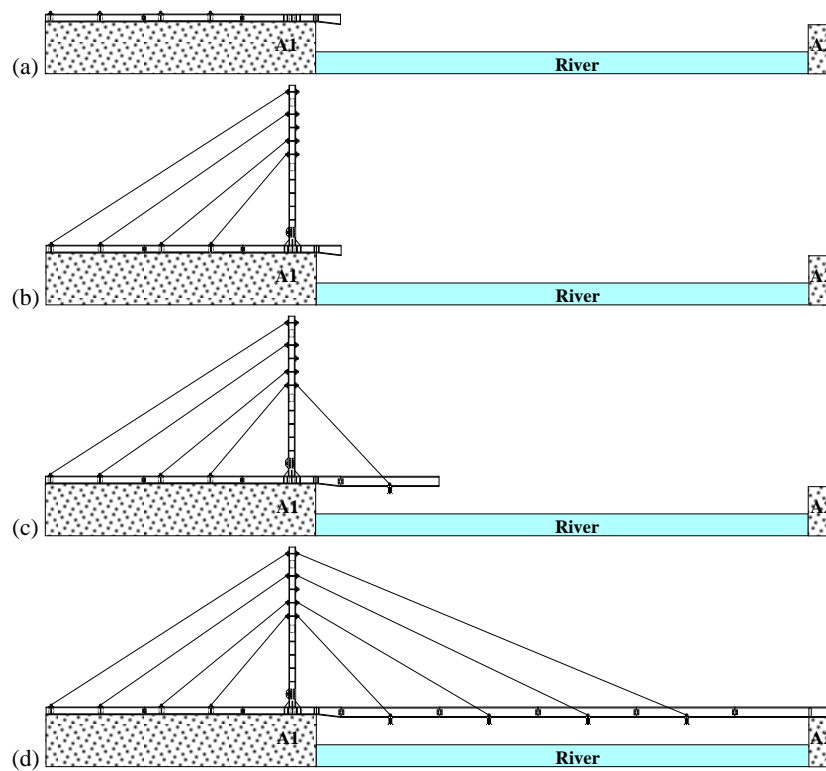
Construction sequences of a temporary rescue bridge: (a) assemble the weight-balance structural module; (b) assemble the bridge-tower structural module; (c) assemble the crossing structural module; and (d) complete the temporary rescue bridge
